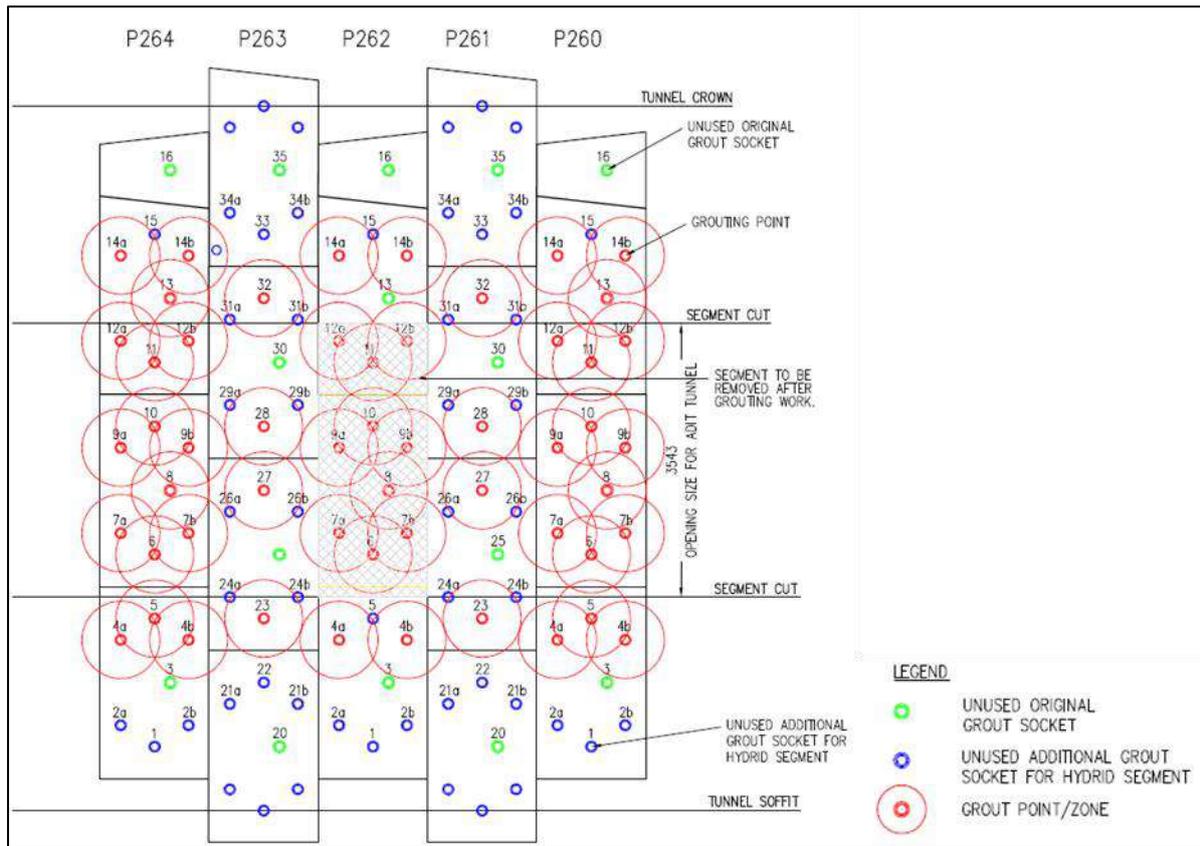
Adit Tunnel Grouting Points from Woodlands Bound
